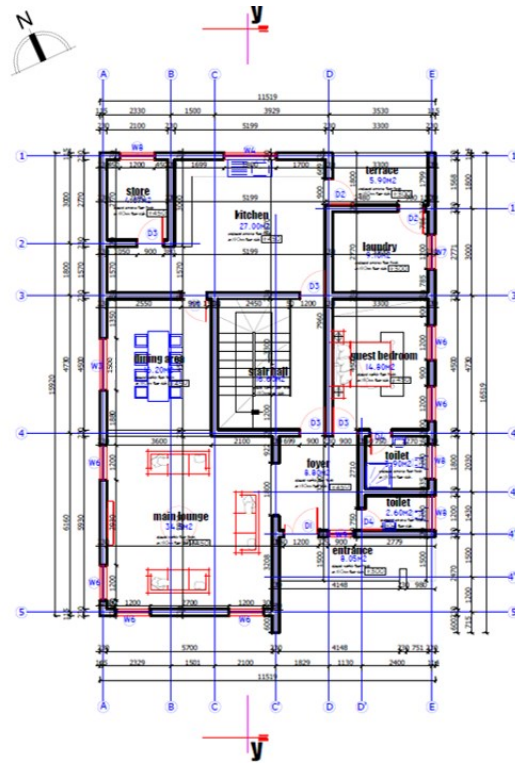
Ground Floor Plan Of A Single Duplex Unit (Block 1) in Case Study One (Ivy Homes)
